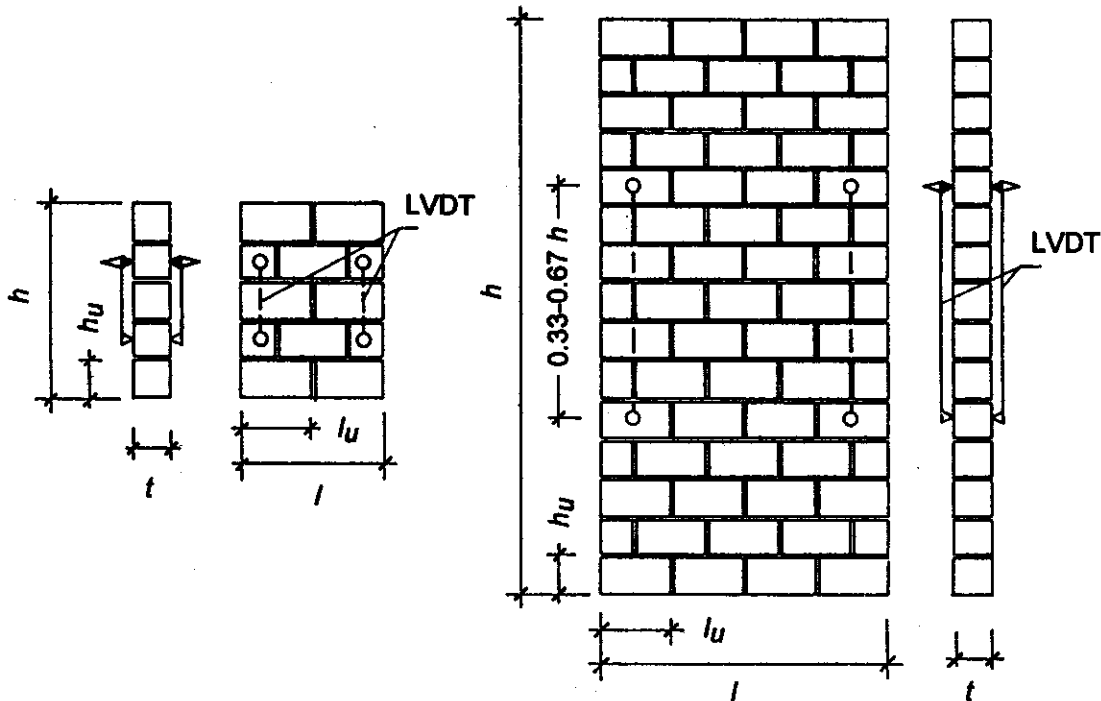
Masonry specimens for compression tests (EN 1052-1)
